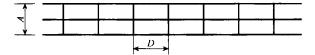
Sectional View of Polycarbonate PC Sheet
